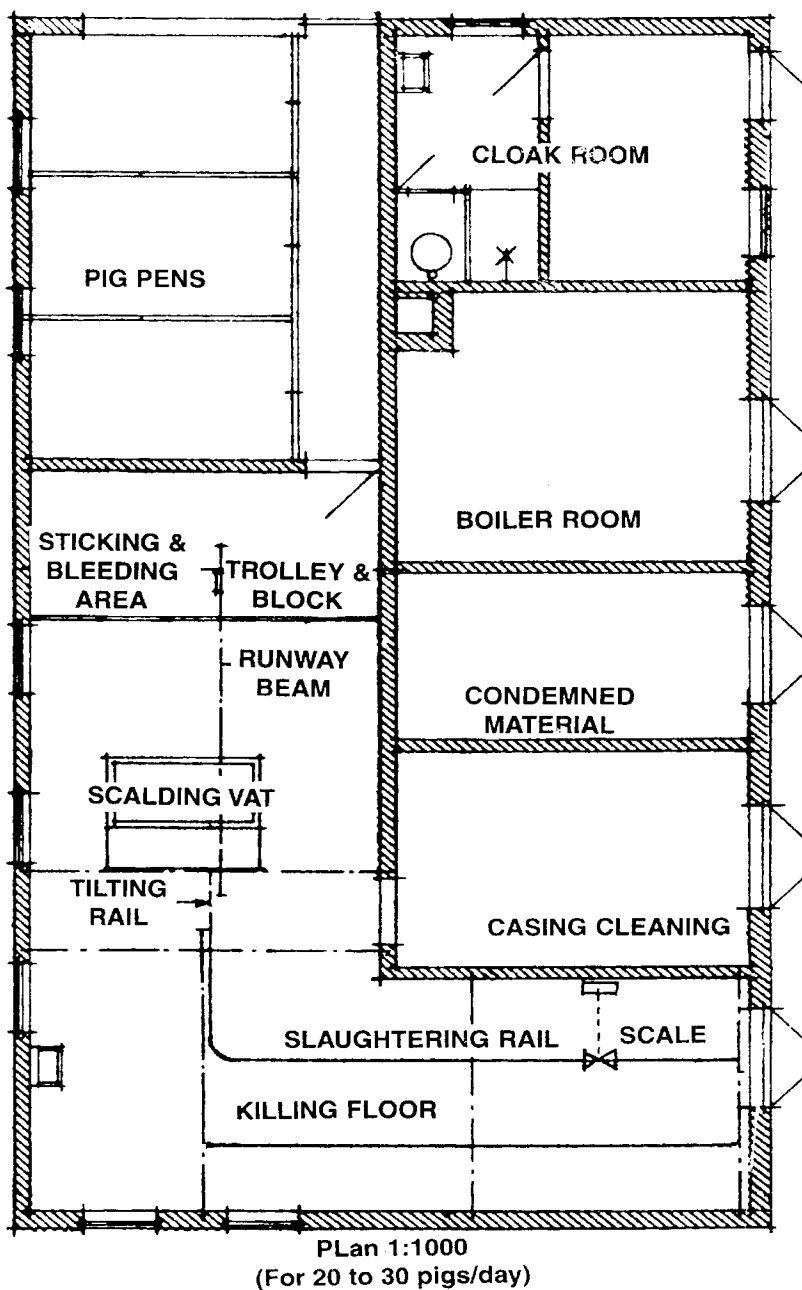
Plan of Pig Slaughte House.
